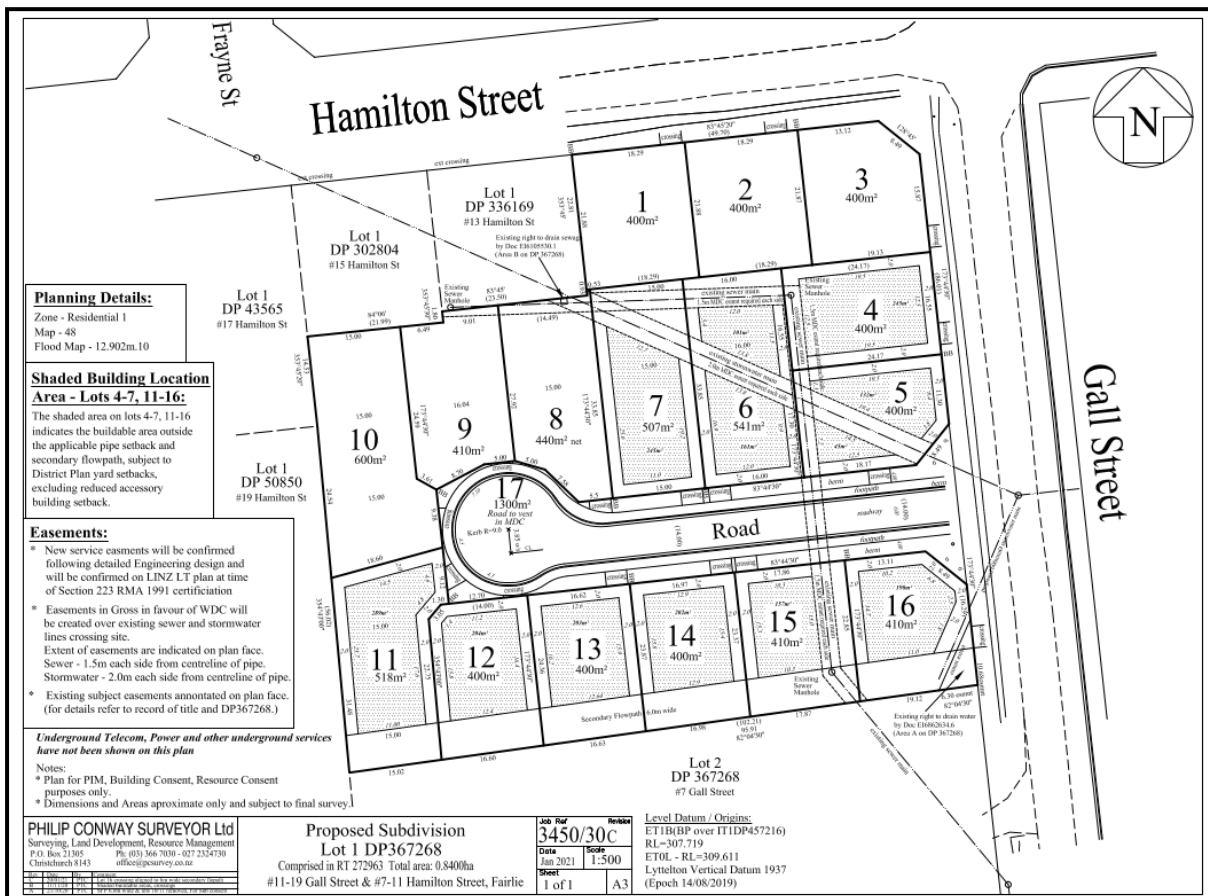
Subdivision Scheme Plan. Dated Jan 2021 (Source: RM200077 AEE)
